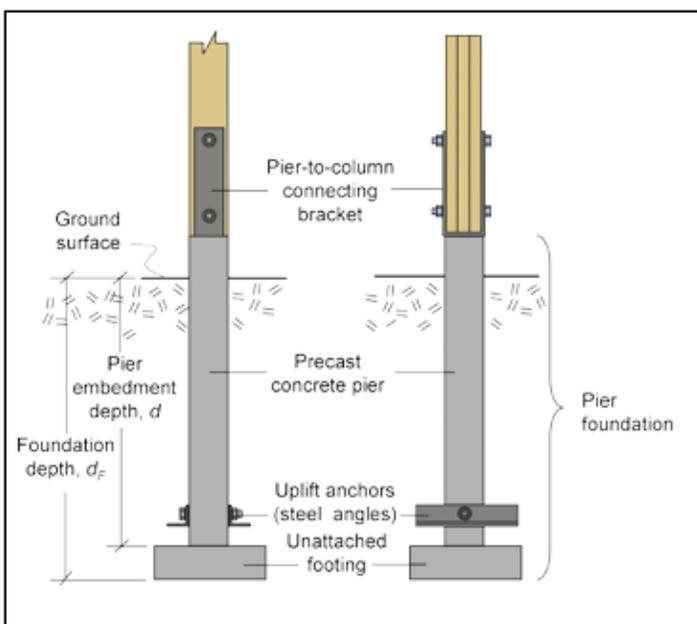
to 4 from the revised EP are reproduced here and provide examples of a preservative-treated wood post foundation, a helical pier foundation, a precast concrete pier foundation and a cast-in-place concrete pier foundation, respectively.
